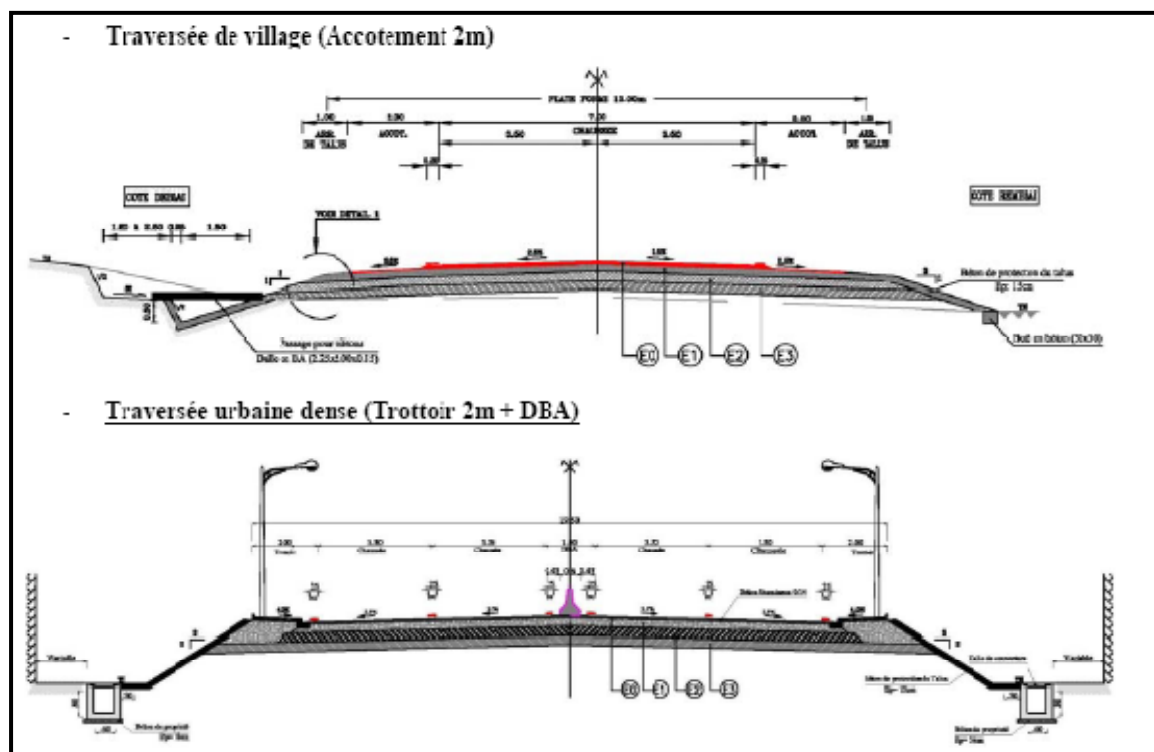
Typical cross-section in current section - Missing links – Chadian Section
